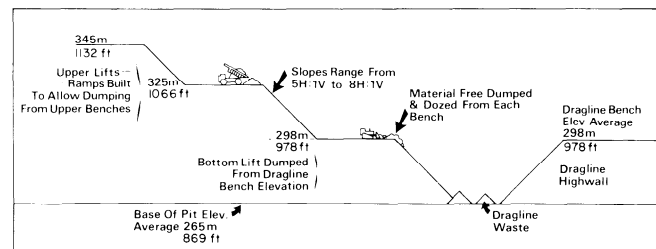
Typical in-pit overburden dump cross section.
